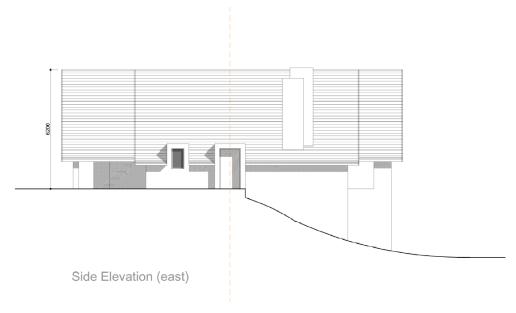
Extract from 16182 (PL) 006A Proposed Elevations showing how the building responds to the slope of the site.
